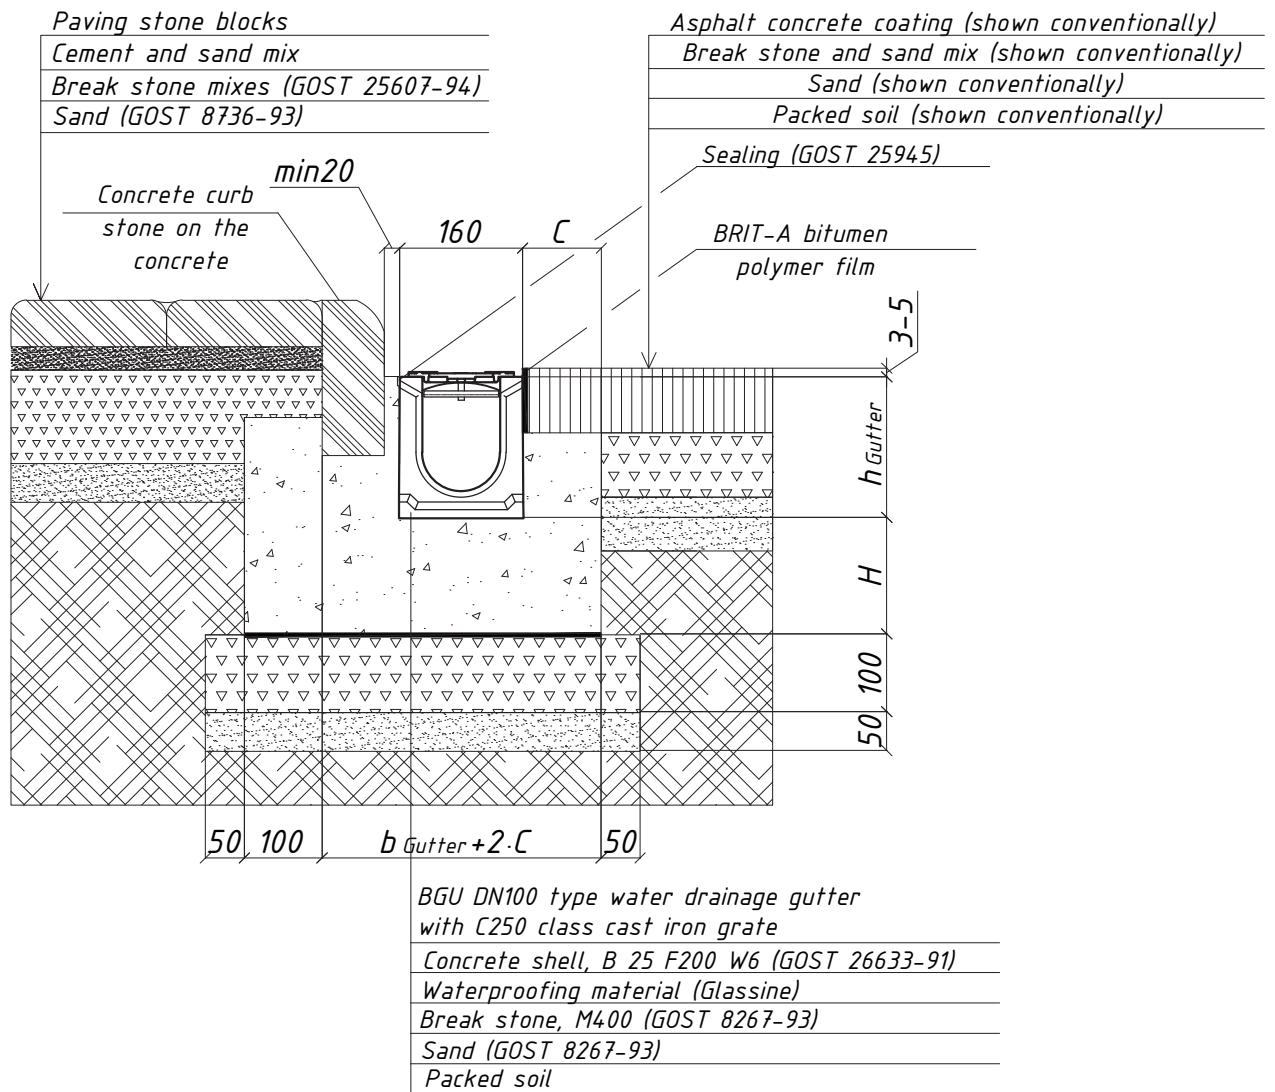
Installation diagram for BGU type concrete water drainage gutter with C250 class cast iron grate
